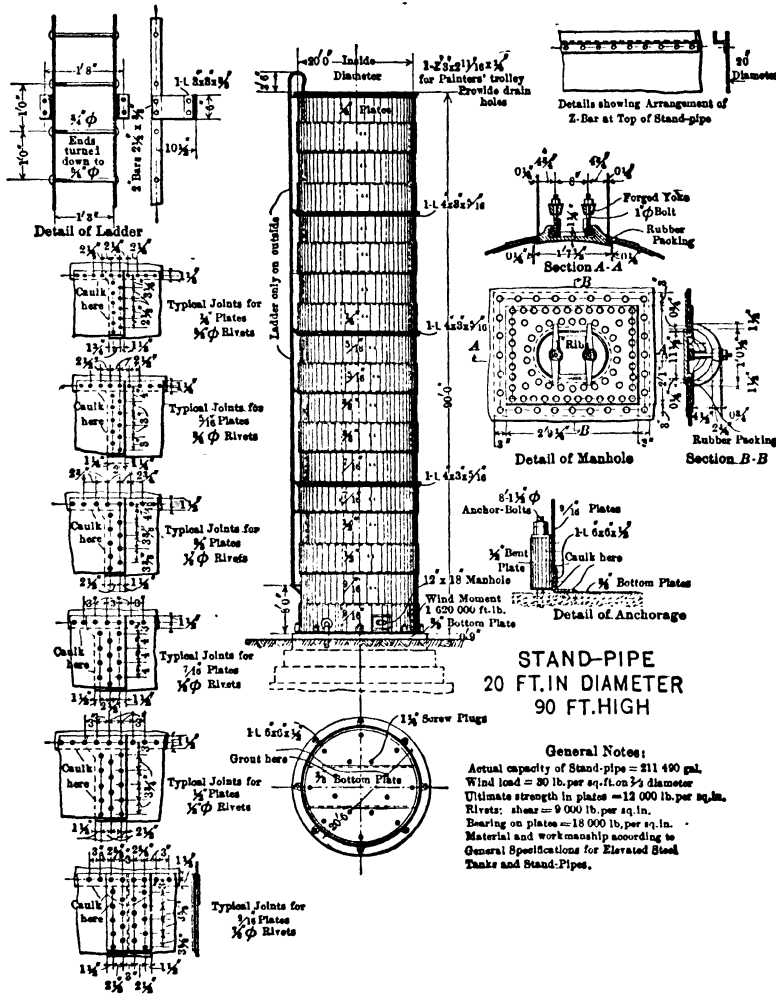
STANDARD PLAN OF STAND-PIPE, BY C. W. BIRCH-NORD.
